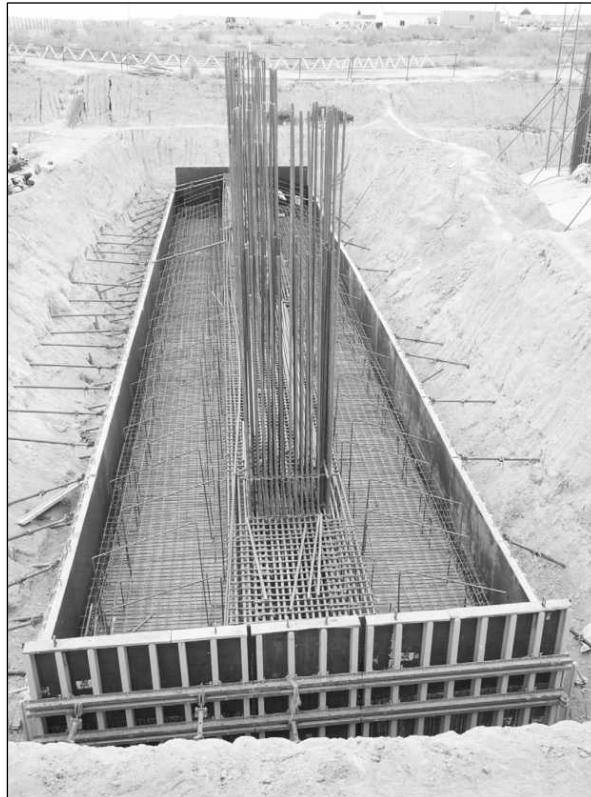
Footing Form Arrangement Showing Braces Being Supported by Excavated Earth.
